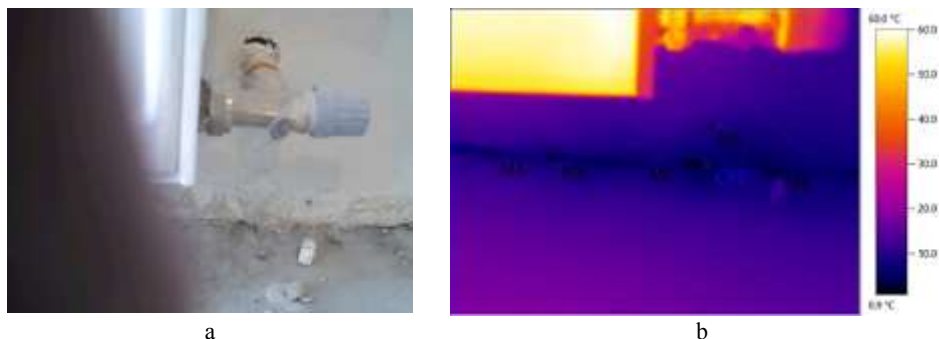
Thermogram of wall exterior envelope of room No. 3: a - full-scale photo of the wall; b - thermogram of the wall (M1=4.6°C, M2=5.7°C, M3=5.3°C, M4=8.2°C, M5=9.6°C, CS1=0.9°C).
